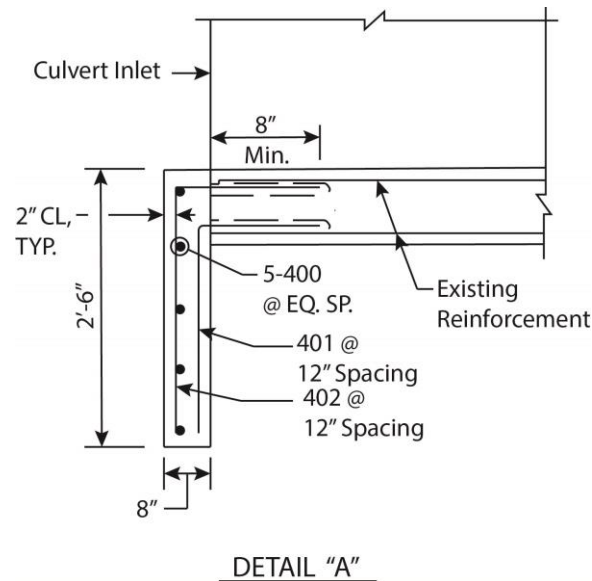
Concrete Collar Detail (Courtesy of Florida DOT)
